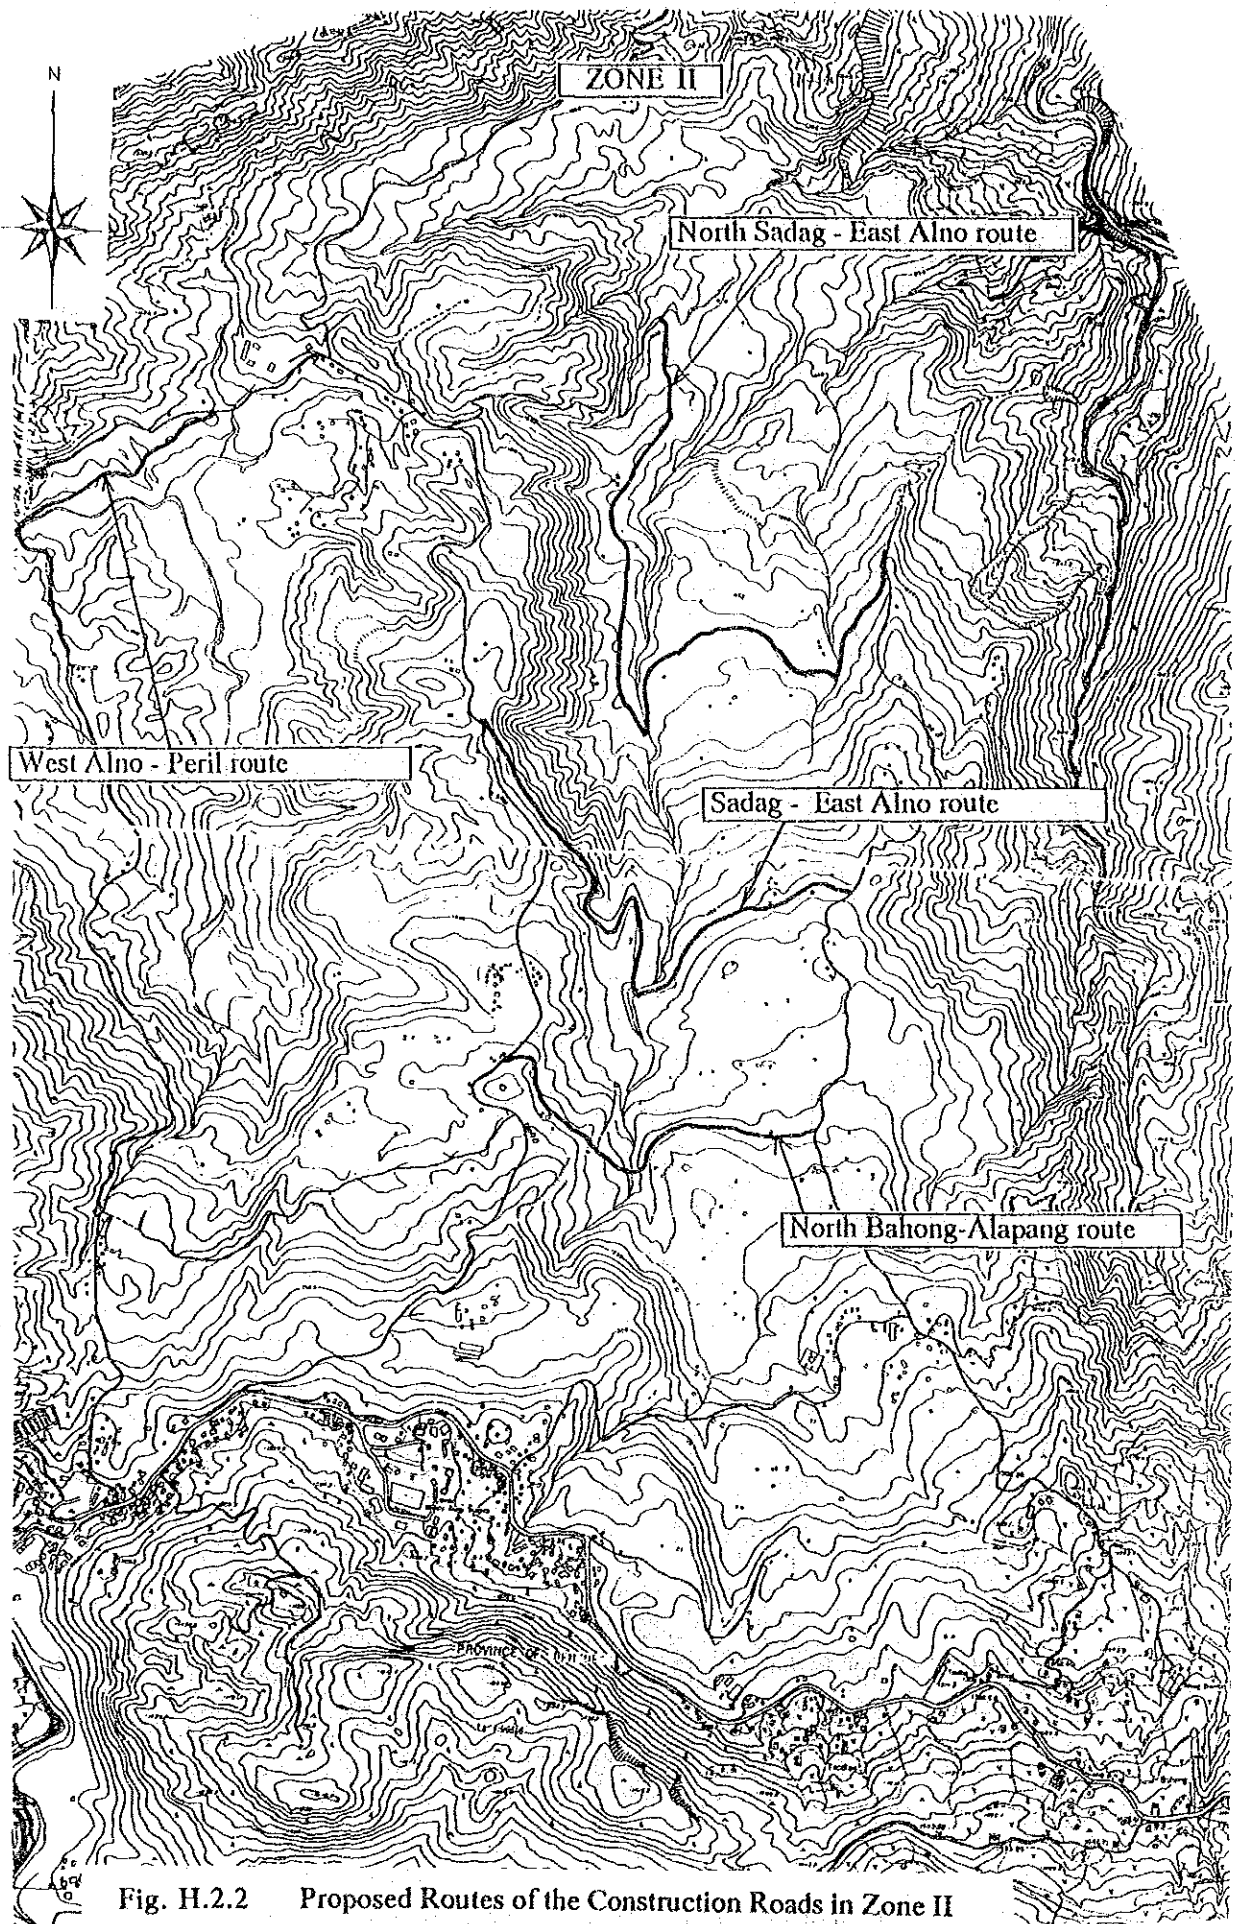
Proposed Routes of the Construction Roads in Zone II
